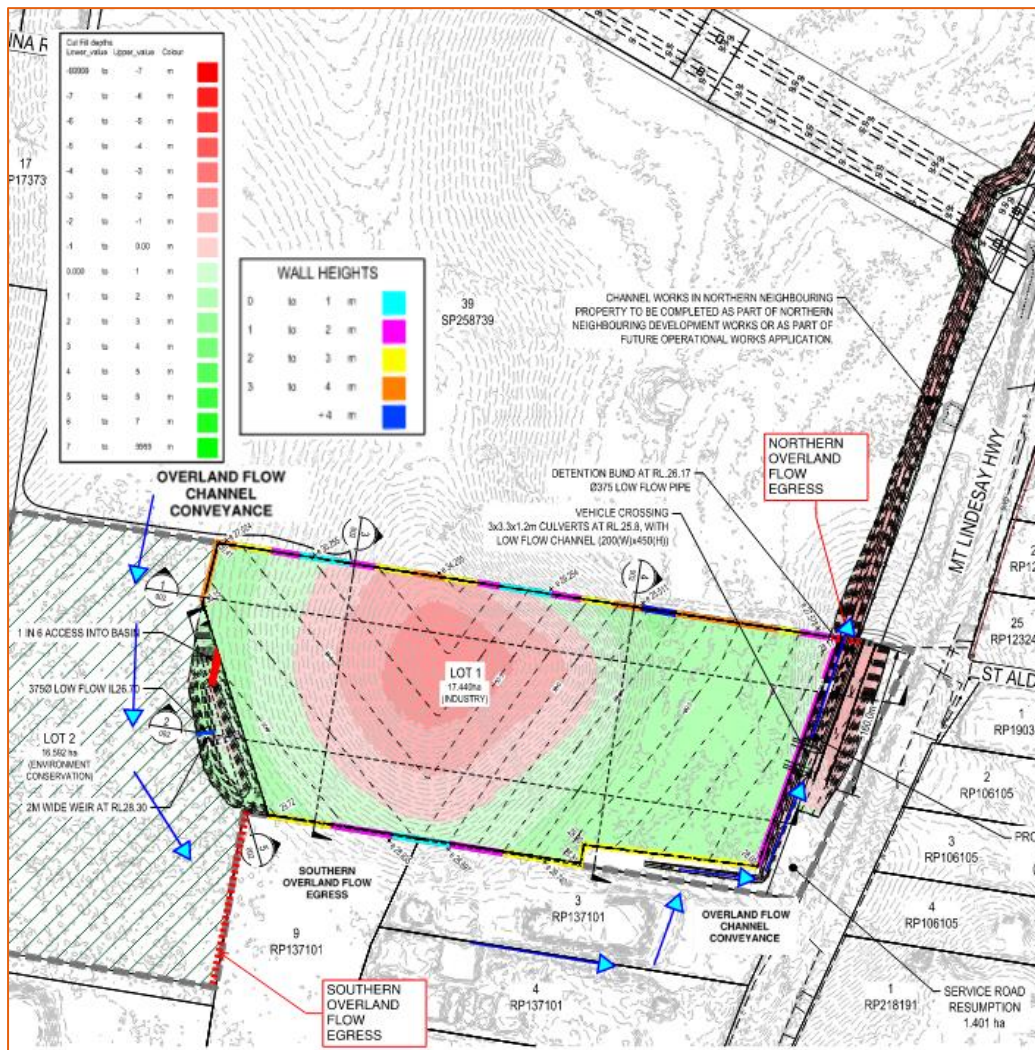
Concept Proposed Bulk Earthworks Layout
